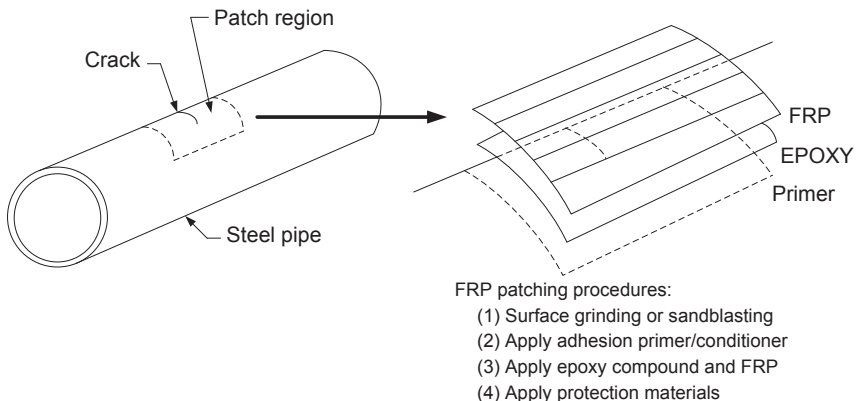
Illustration of the FRP patching for fatigue crack repair of steel pipe.
